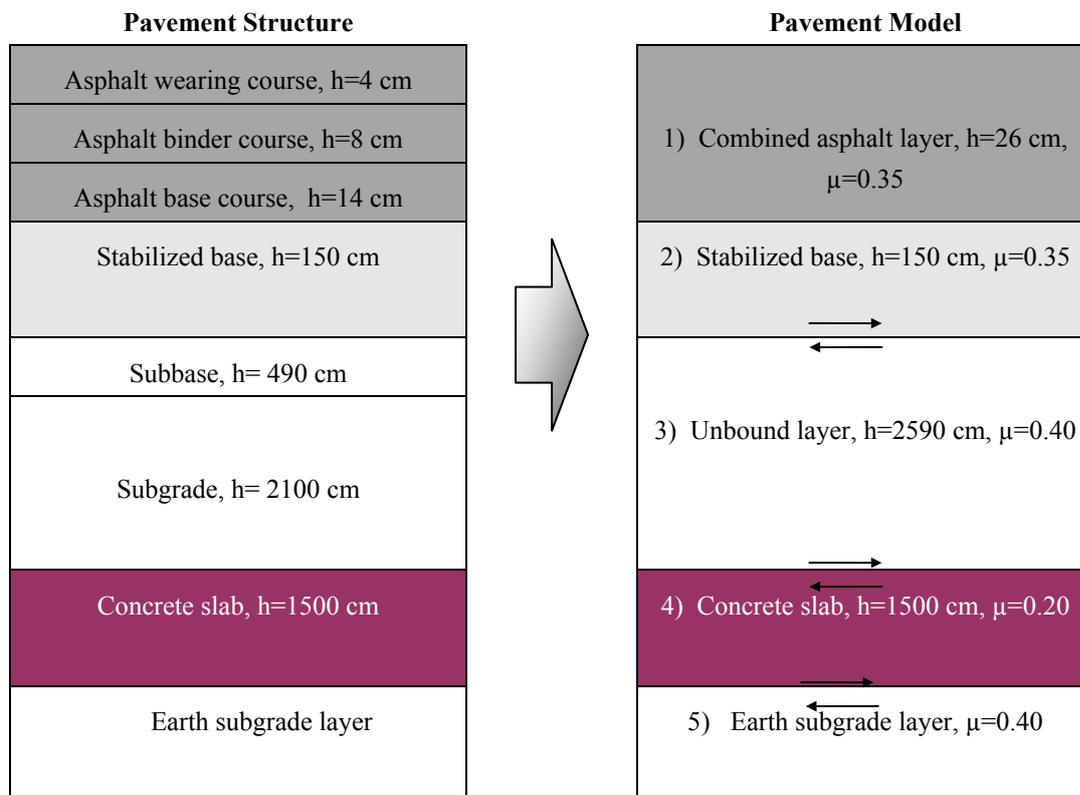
Pavement structure and pavement model of testing point no.1.1.1 (class SV, line 2.1)
